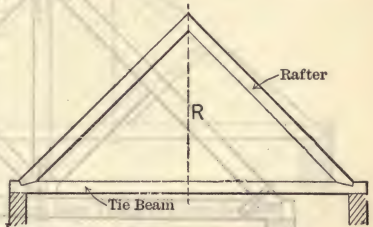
Simplest Three-piece Truss. Spans up to Twenty-four Feet
